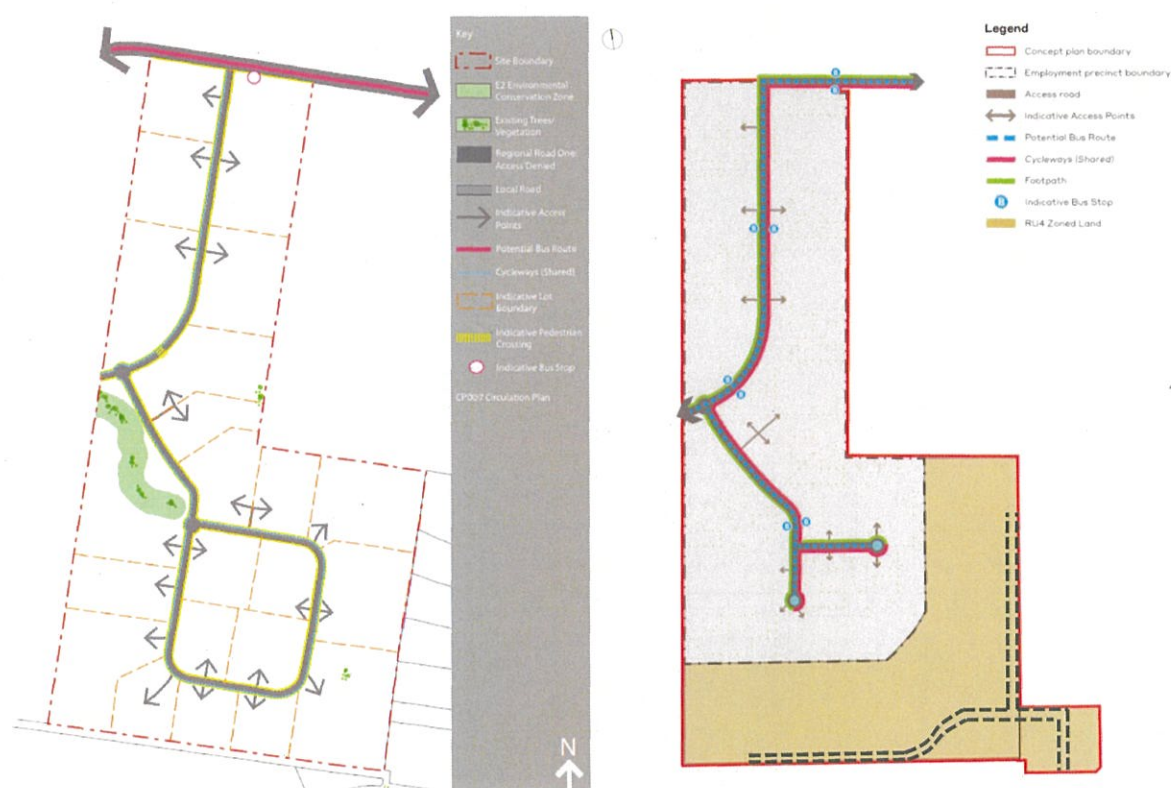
| Approved site access plan (left) and proposed site access plan (right)
